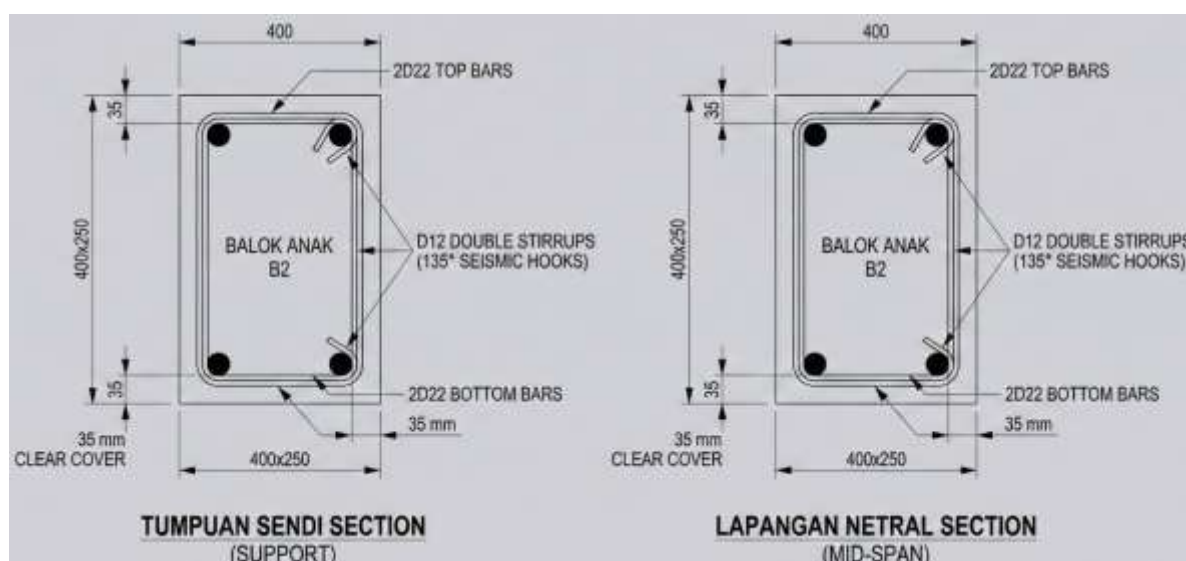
Visual Cross-Sectional View of Type B2 Beam Details
